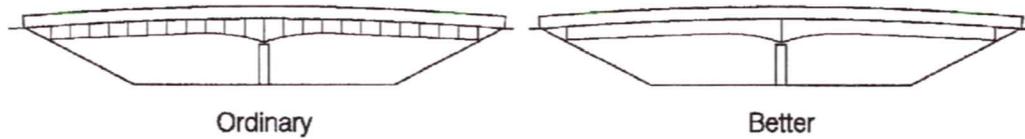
Vertical stiffeners can make the girder appear heavier than compared to girders that limit their use to bearing points. The figure above illustrates the use of vertical stiffeners at points of force transfer. (From Maryland Department of Transportation, *Aesthetic Bridges User Guide*, August 1993, page III-15).
